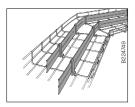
is used for mounting of Separating Plate B36 onto Mesh tray.
